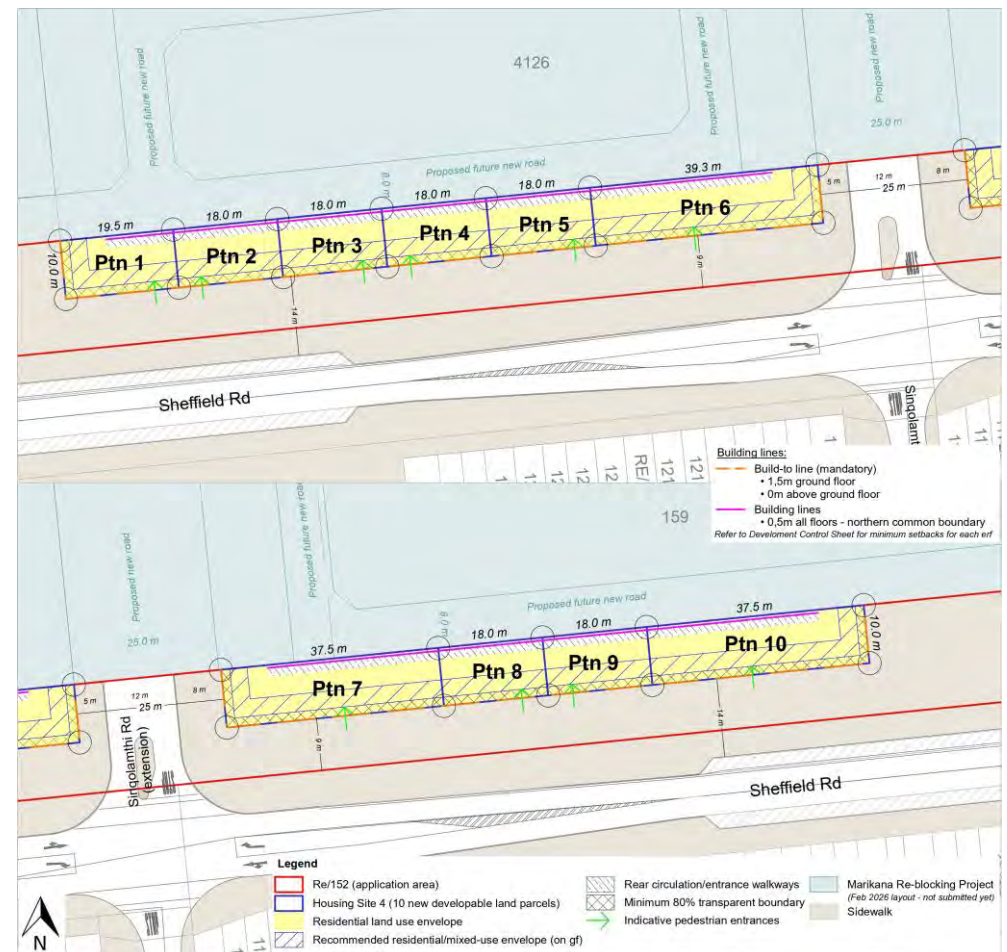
Site Development Plan for Housing Site 4 (GAPP & @P, 2026)
